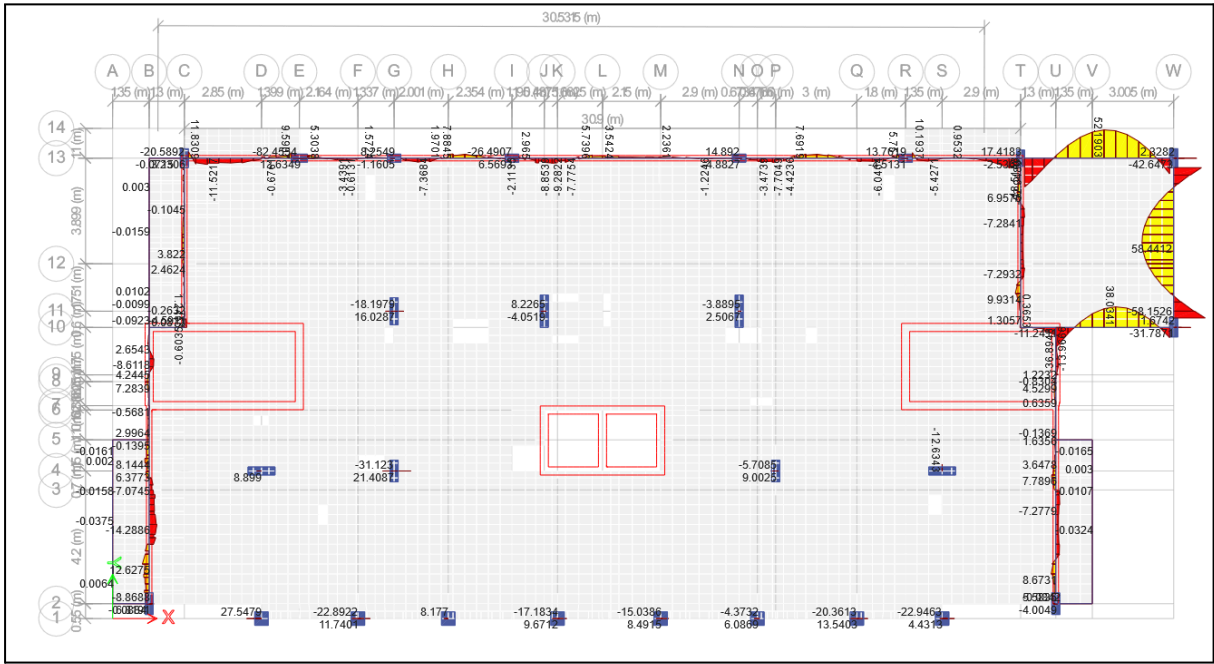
Bending moment M3-3 in beams at the ground floor
